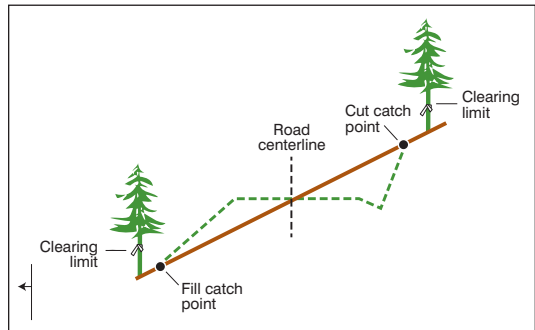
Construction survey staking a road section. Source: Brian Kramer
